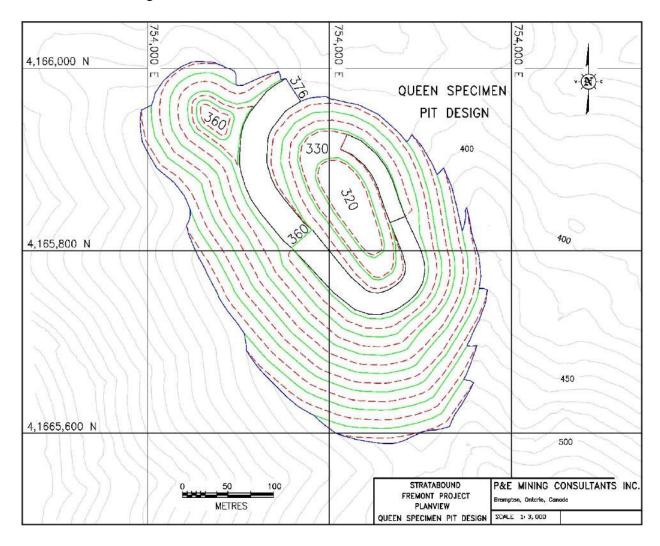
QUEEN SPECIMEN PIT DESIGN
